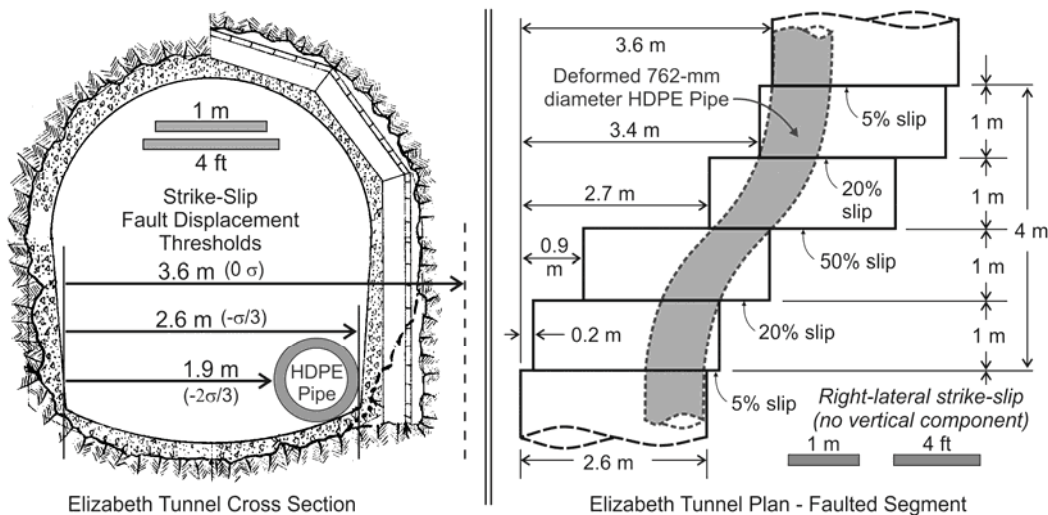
Elizabeth Tunnel cross section and plan showing fault slip scenario. Left. Cross section; Right. Plan with five fault traces distributed over 4 m length.
